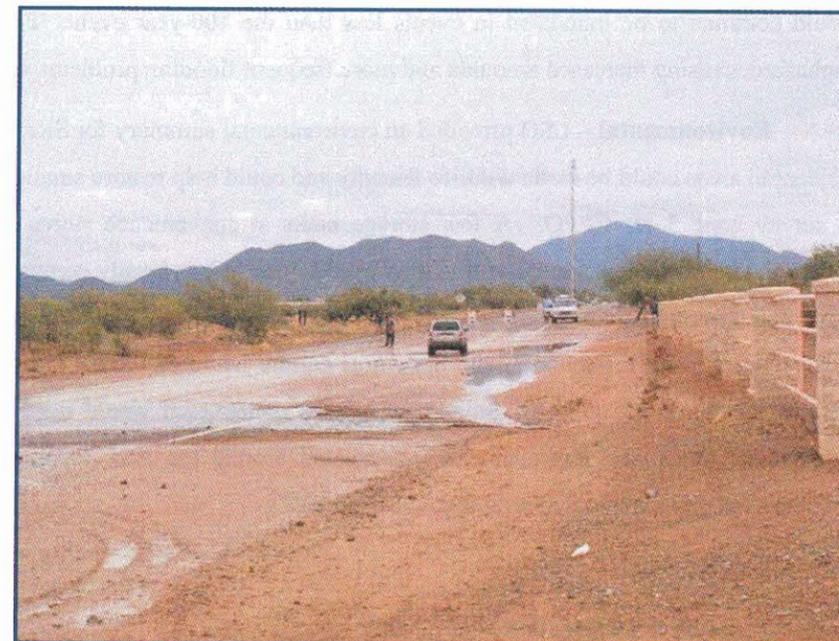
Desert Lake Wash Flooding at Cloud Road (10-10-03)
